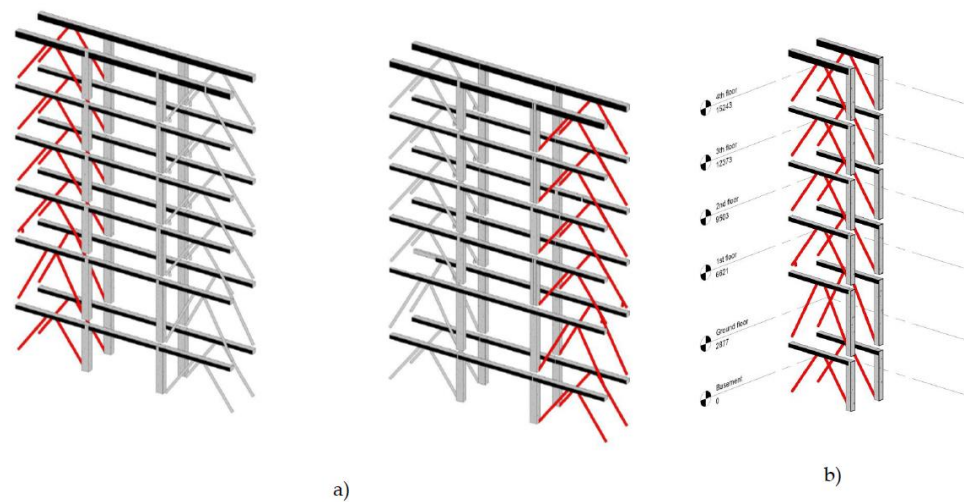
Additional steel bracings: (a) both Sections A and C; (b) detail on Section A.
